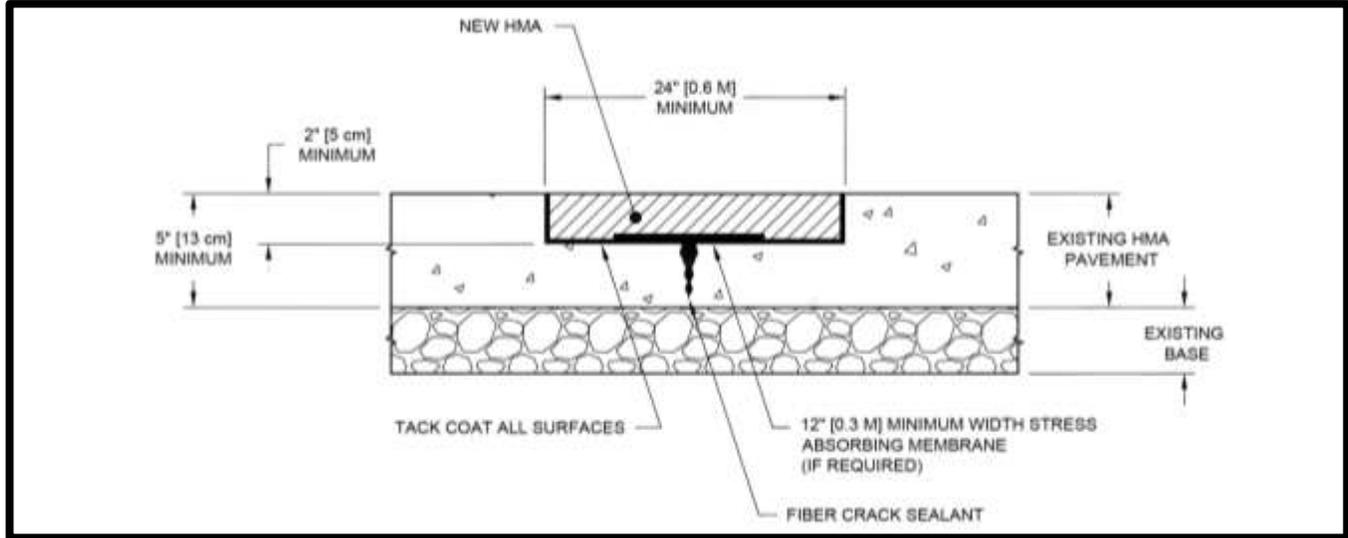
Partial depth crack repair in flexible pavement
